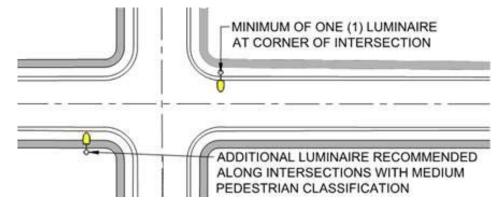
Typical Intersection Lighting Layout with No Signals and Non-Continuous Lighting
